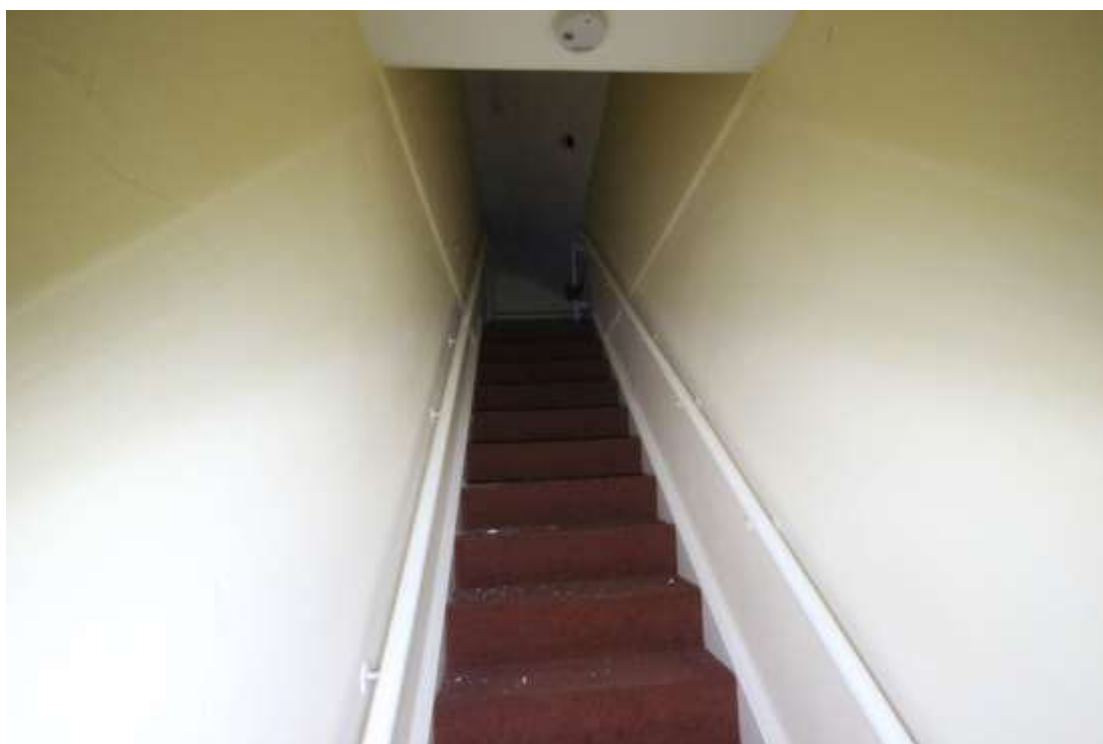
View of the staircase in Block A leading to the attic, facing east.
